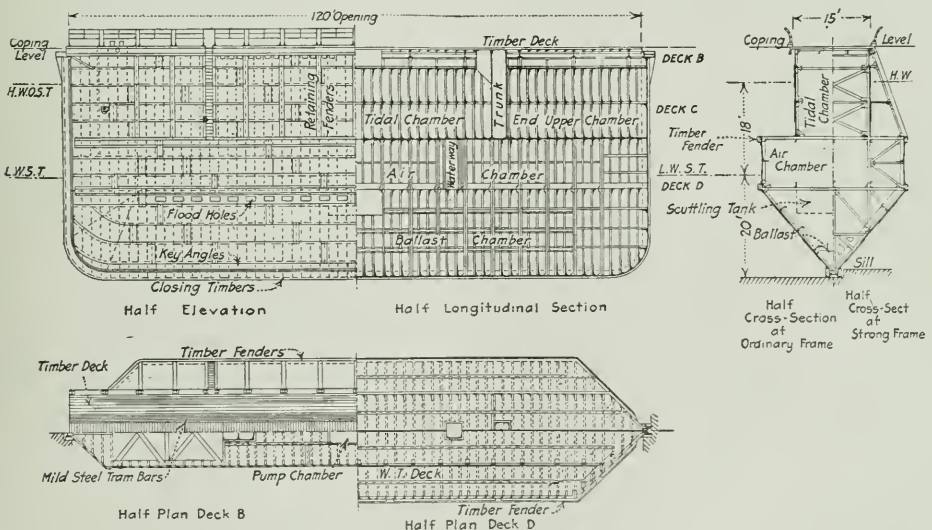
Elevation, Plan and Sections of Floating Caisson.
